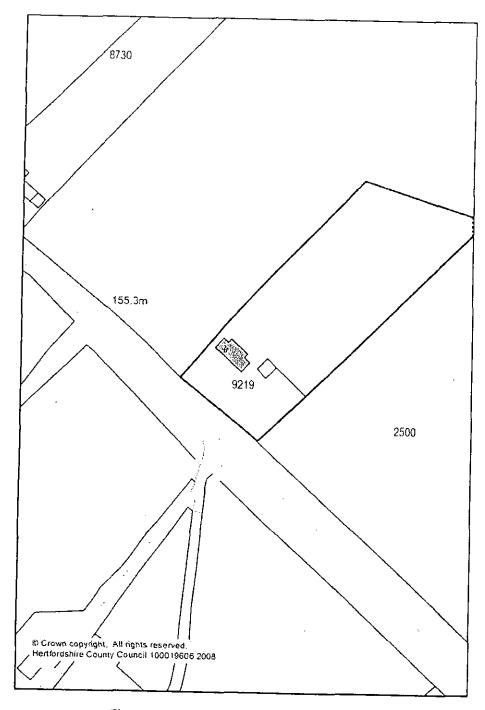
Site plan. 38 Gaddesden Row shown in red. (scale 1:1250)
